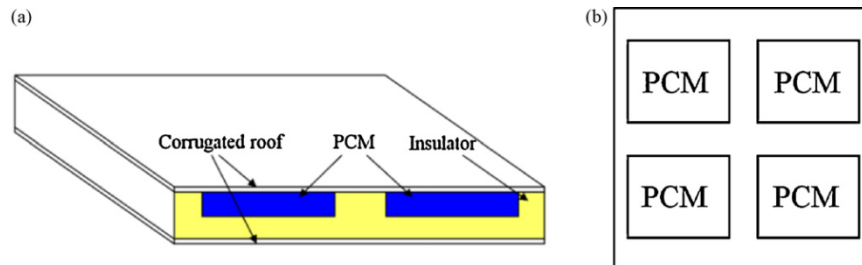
Novel design structure of the corrugated roofing. (a) 3D view; (b) Top view (Chou et al. (2013))
